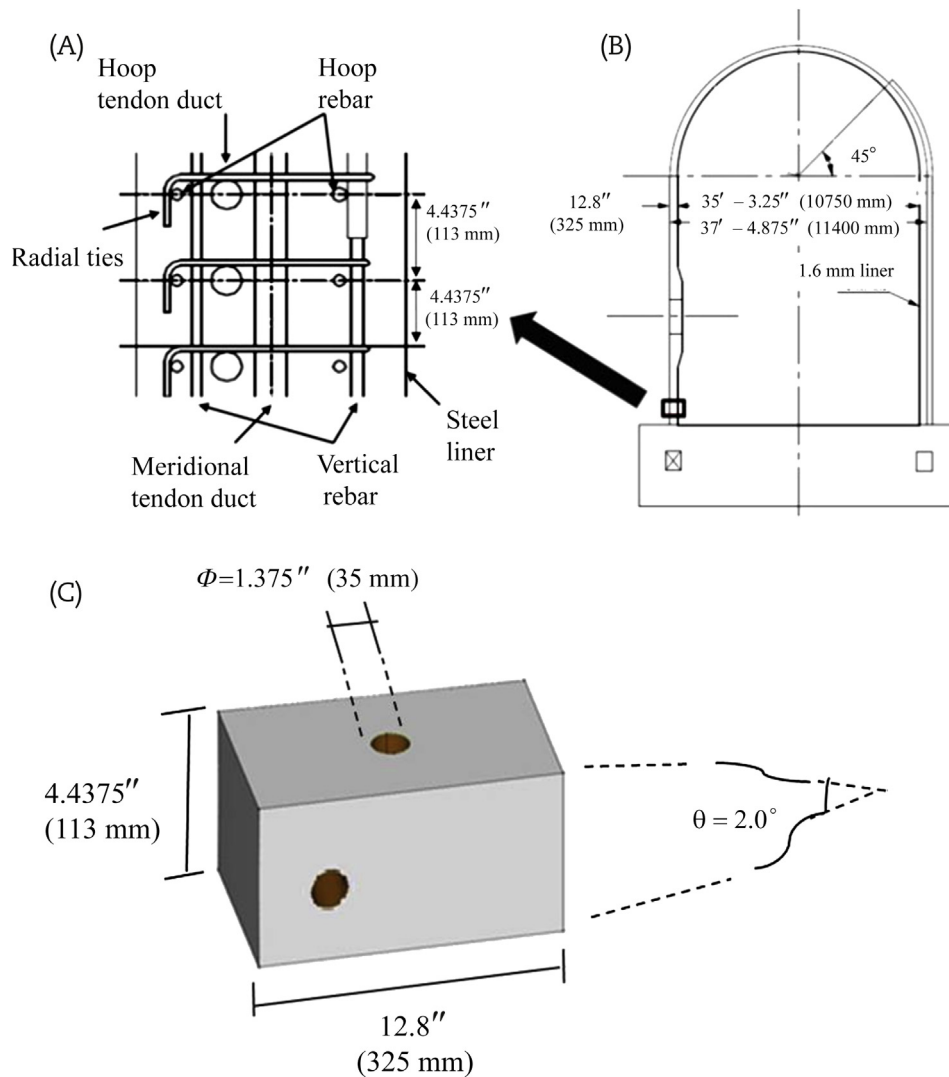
The 1:4 scale PCCV model. (A) Typical wall section. (B) 1:4 scale model section. (C) Unit pattern of tendon ducts arrangement in wall. PCCV, prestressed concrete containment vessel.
